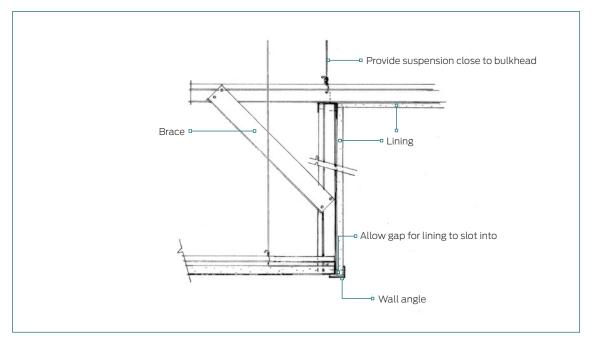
Suspended ceiling and bulkhead, cantilevered top ceiling support.
